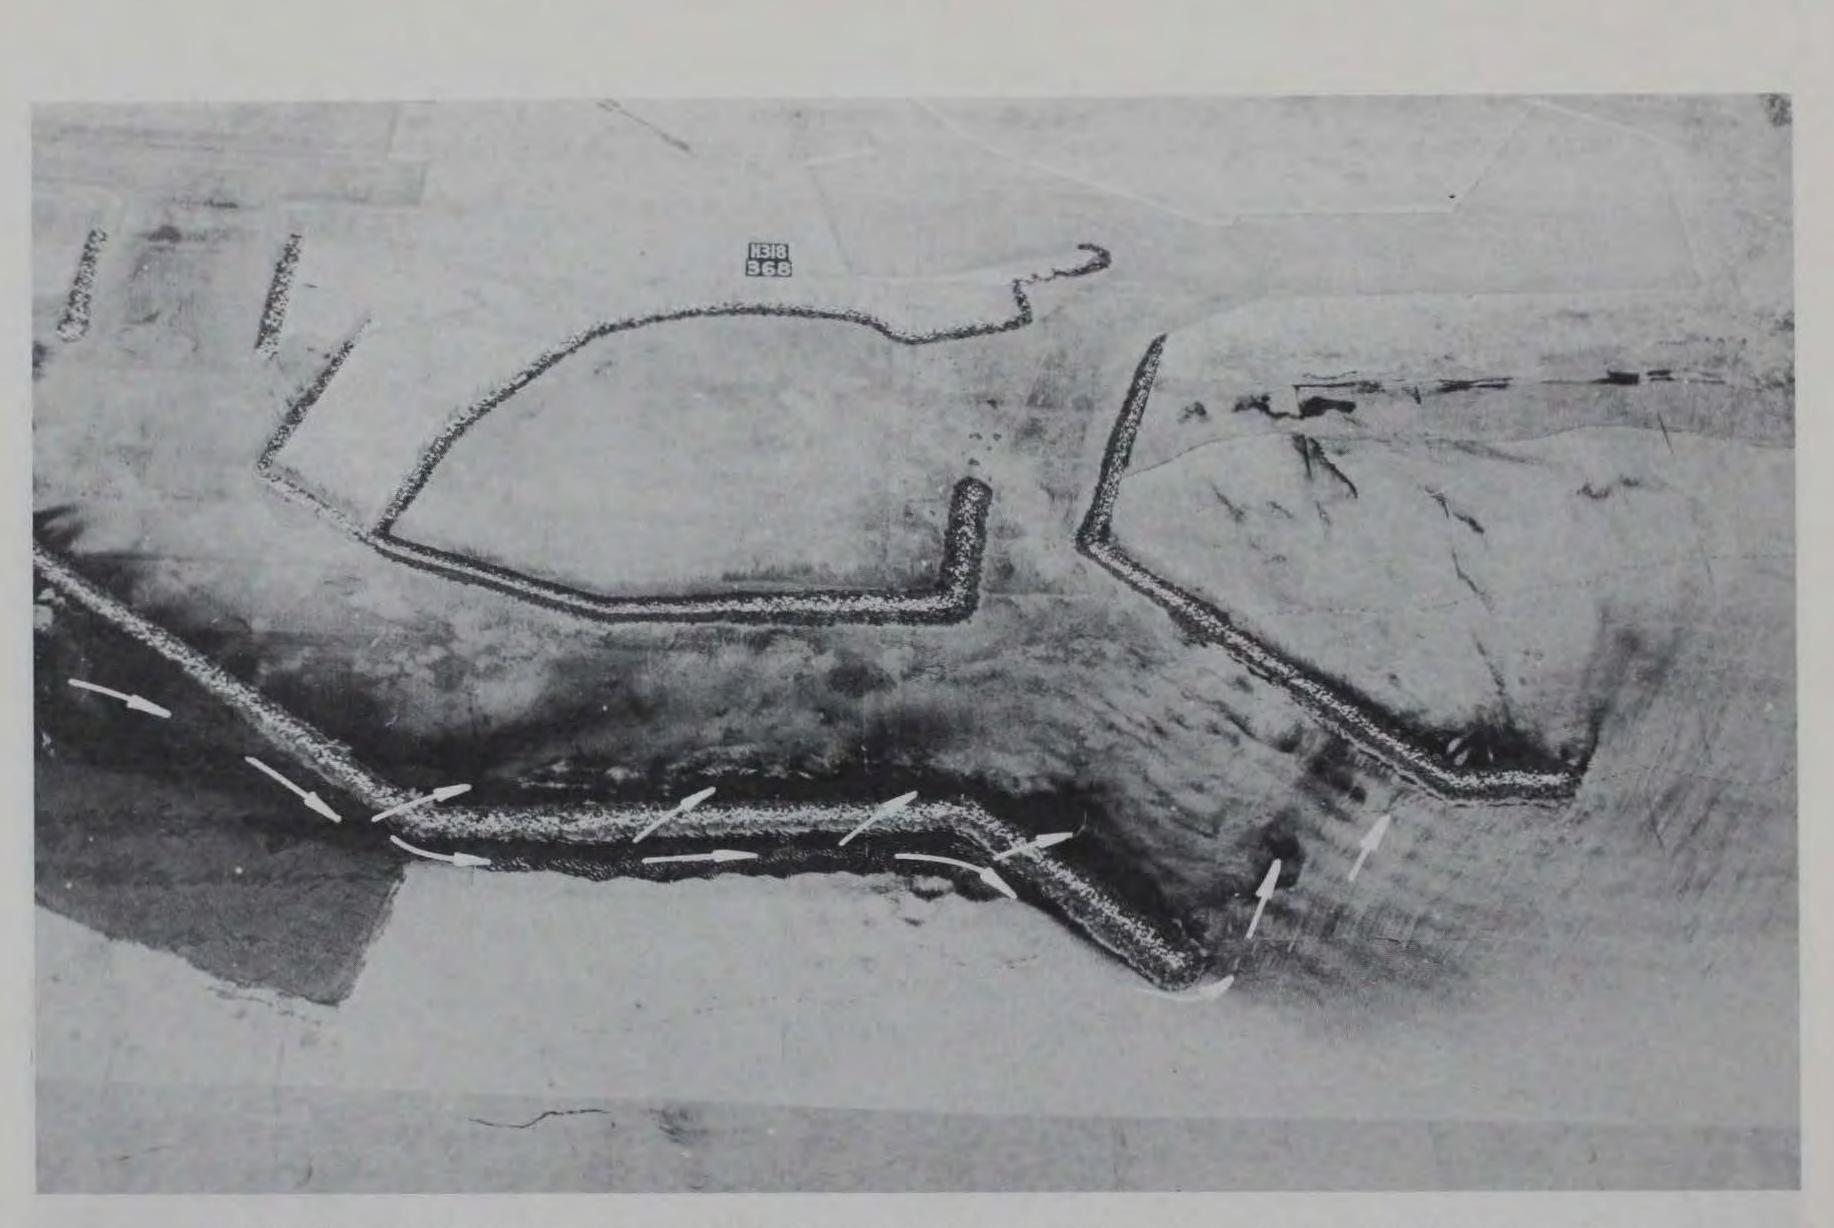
Typical tracer movement for Plan 21A resulting from 7-sec, 10-ft waves from northwest at mhhw
